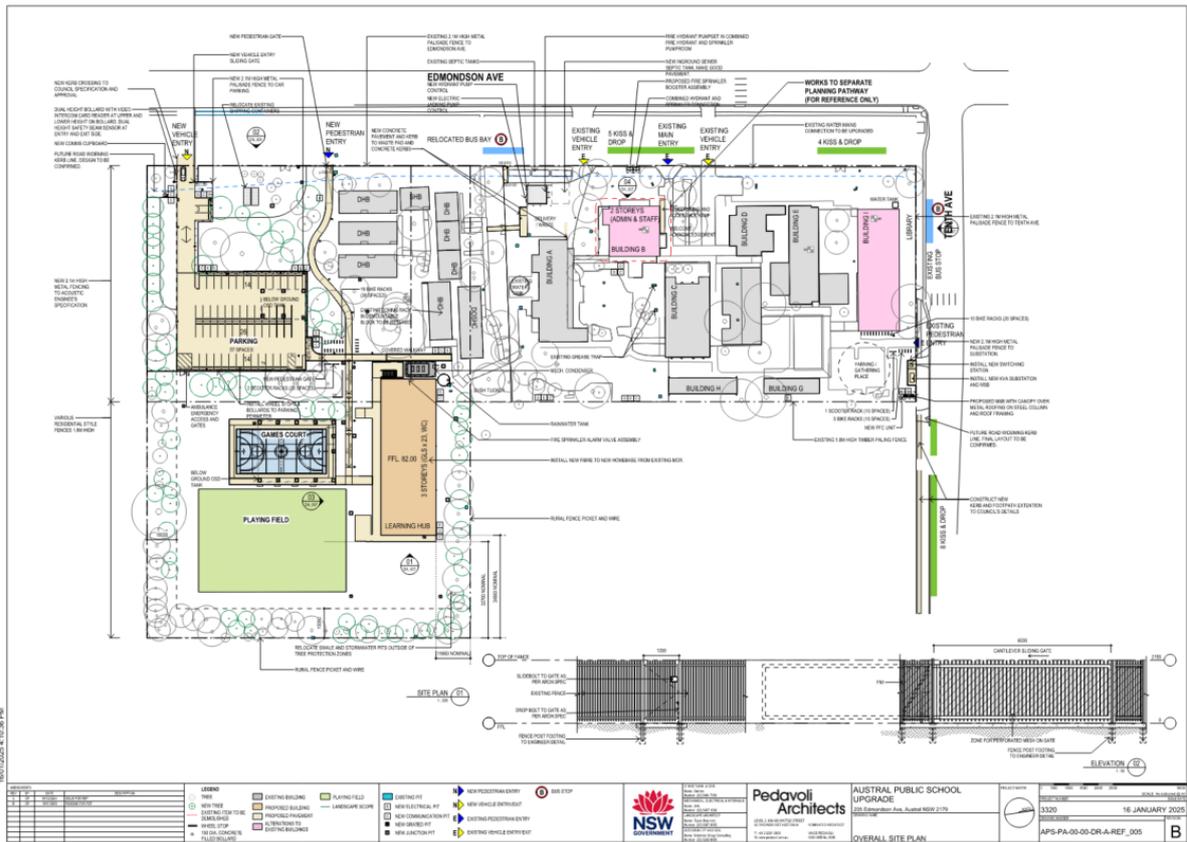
Proposed Site Plan (Source: Pedavoli Architects, Overall Site Plan (Rev B))
